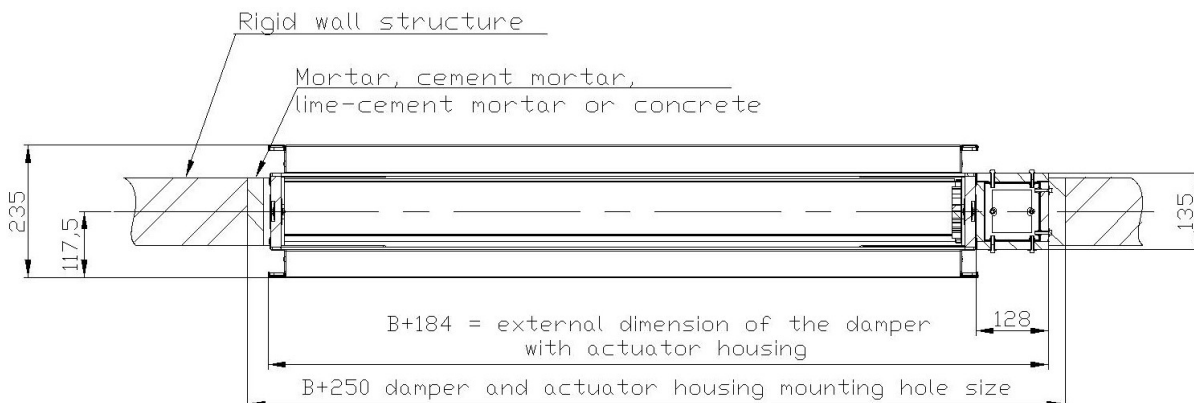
Installing method of WKP-P fire dampers in rigid wall, baffle axis should be in line with wall axis
